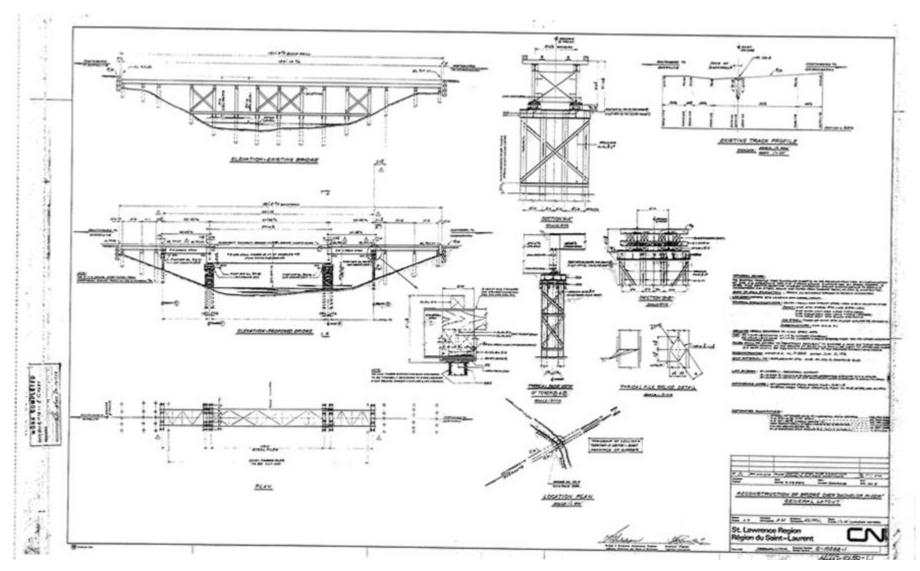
Reconstruction of Bachelor River Bridge Drawing (1974)
